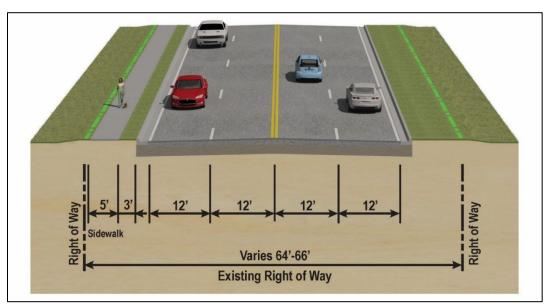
Existing Typical Section – LaVista Drive to SR 17.
